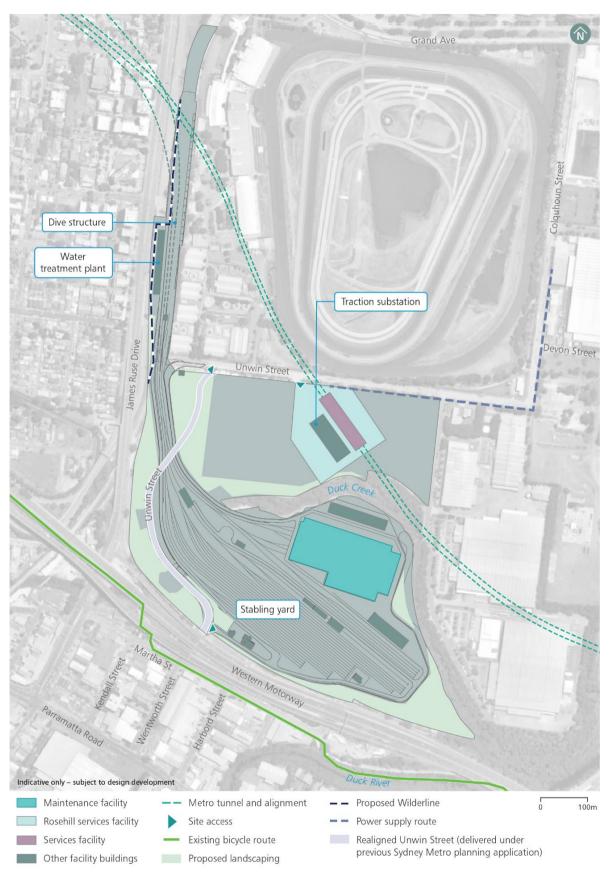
Exhibited indicative layout and key design elements – Clyde stabling and maintenance facility and Rosehill services facility
